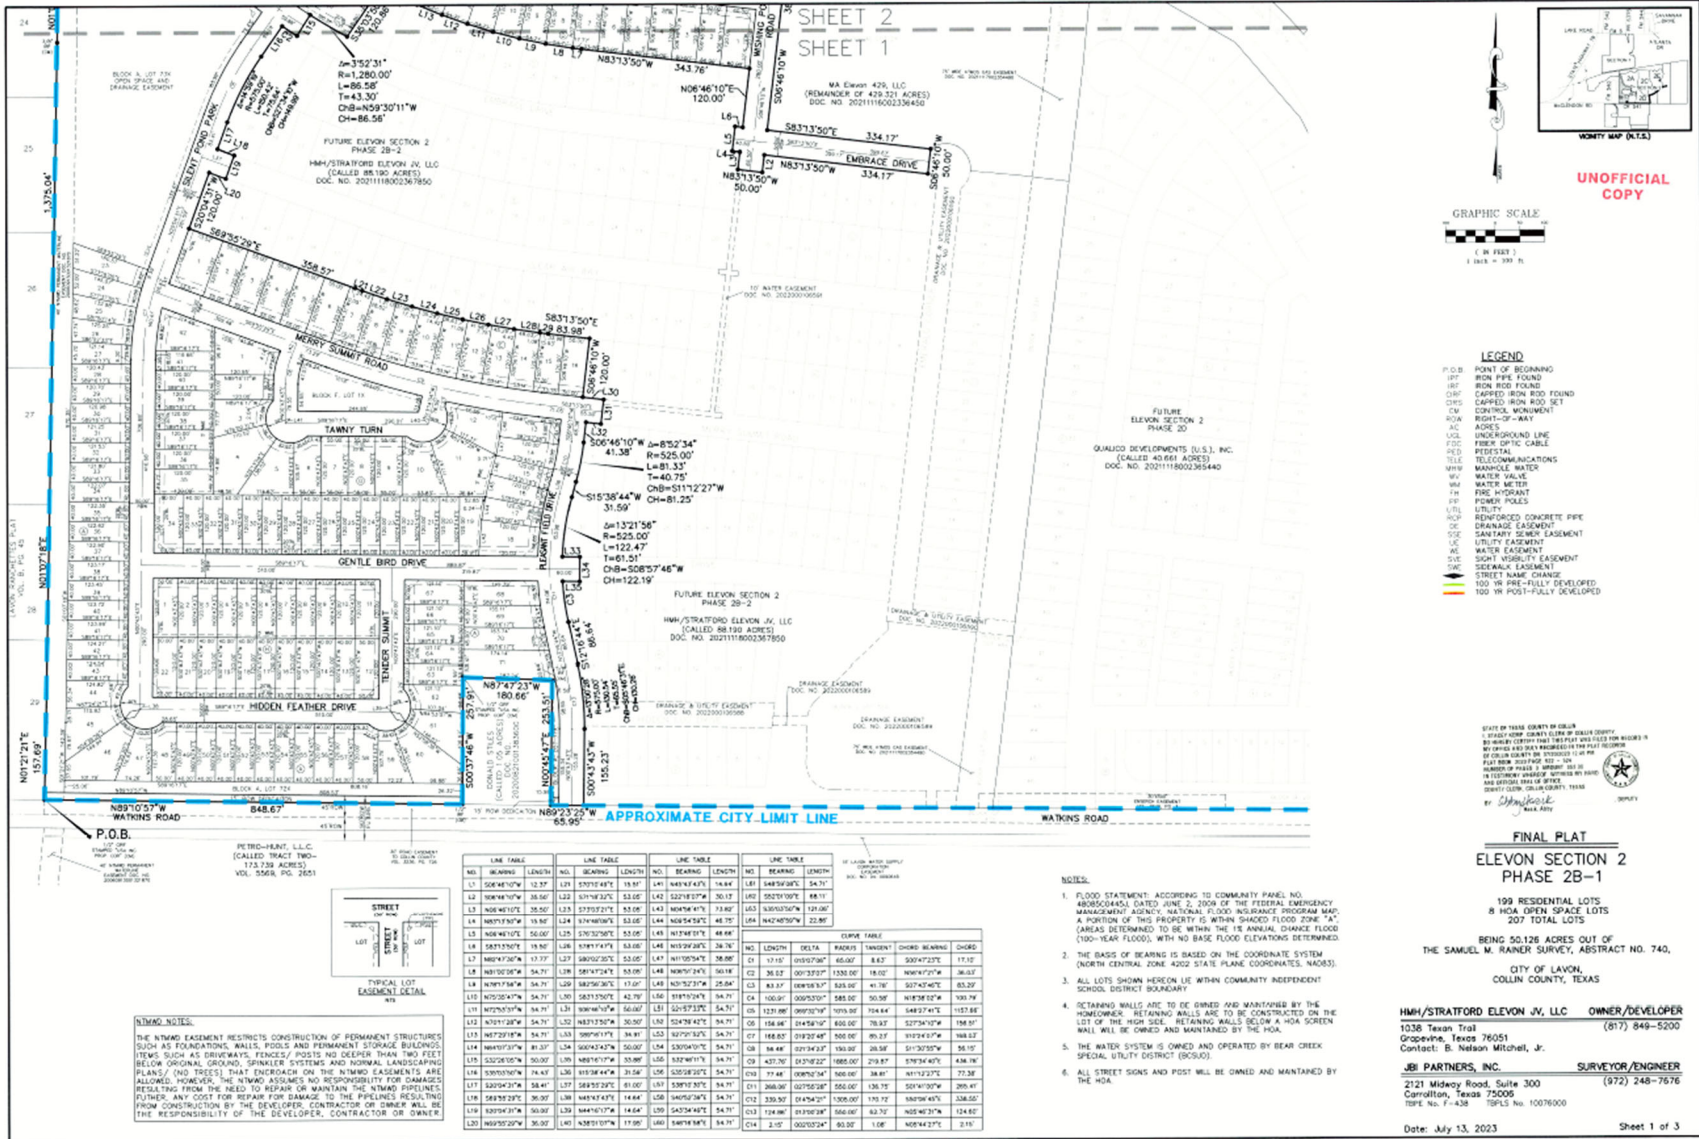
IMPROVEMENT AREA #1 PLATS
